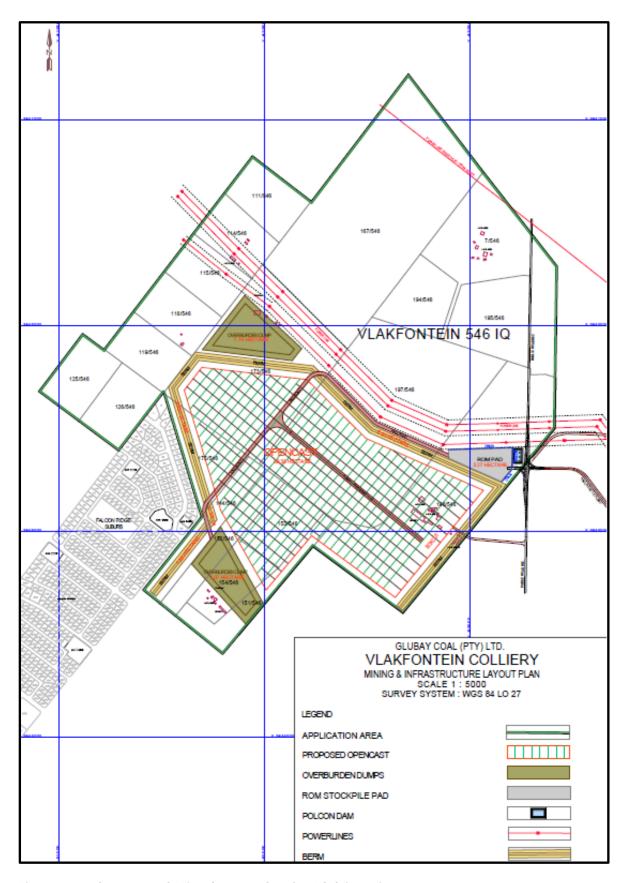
Conceptual Mine layout plan for Vlakfontein
